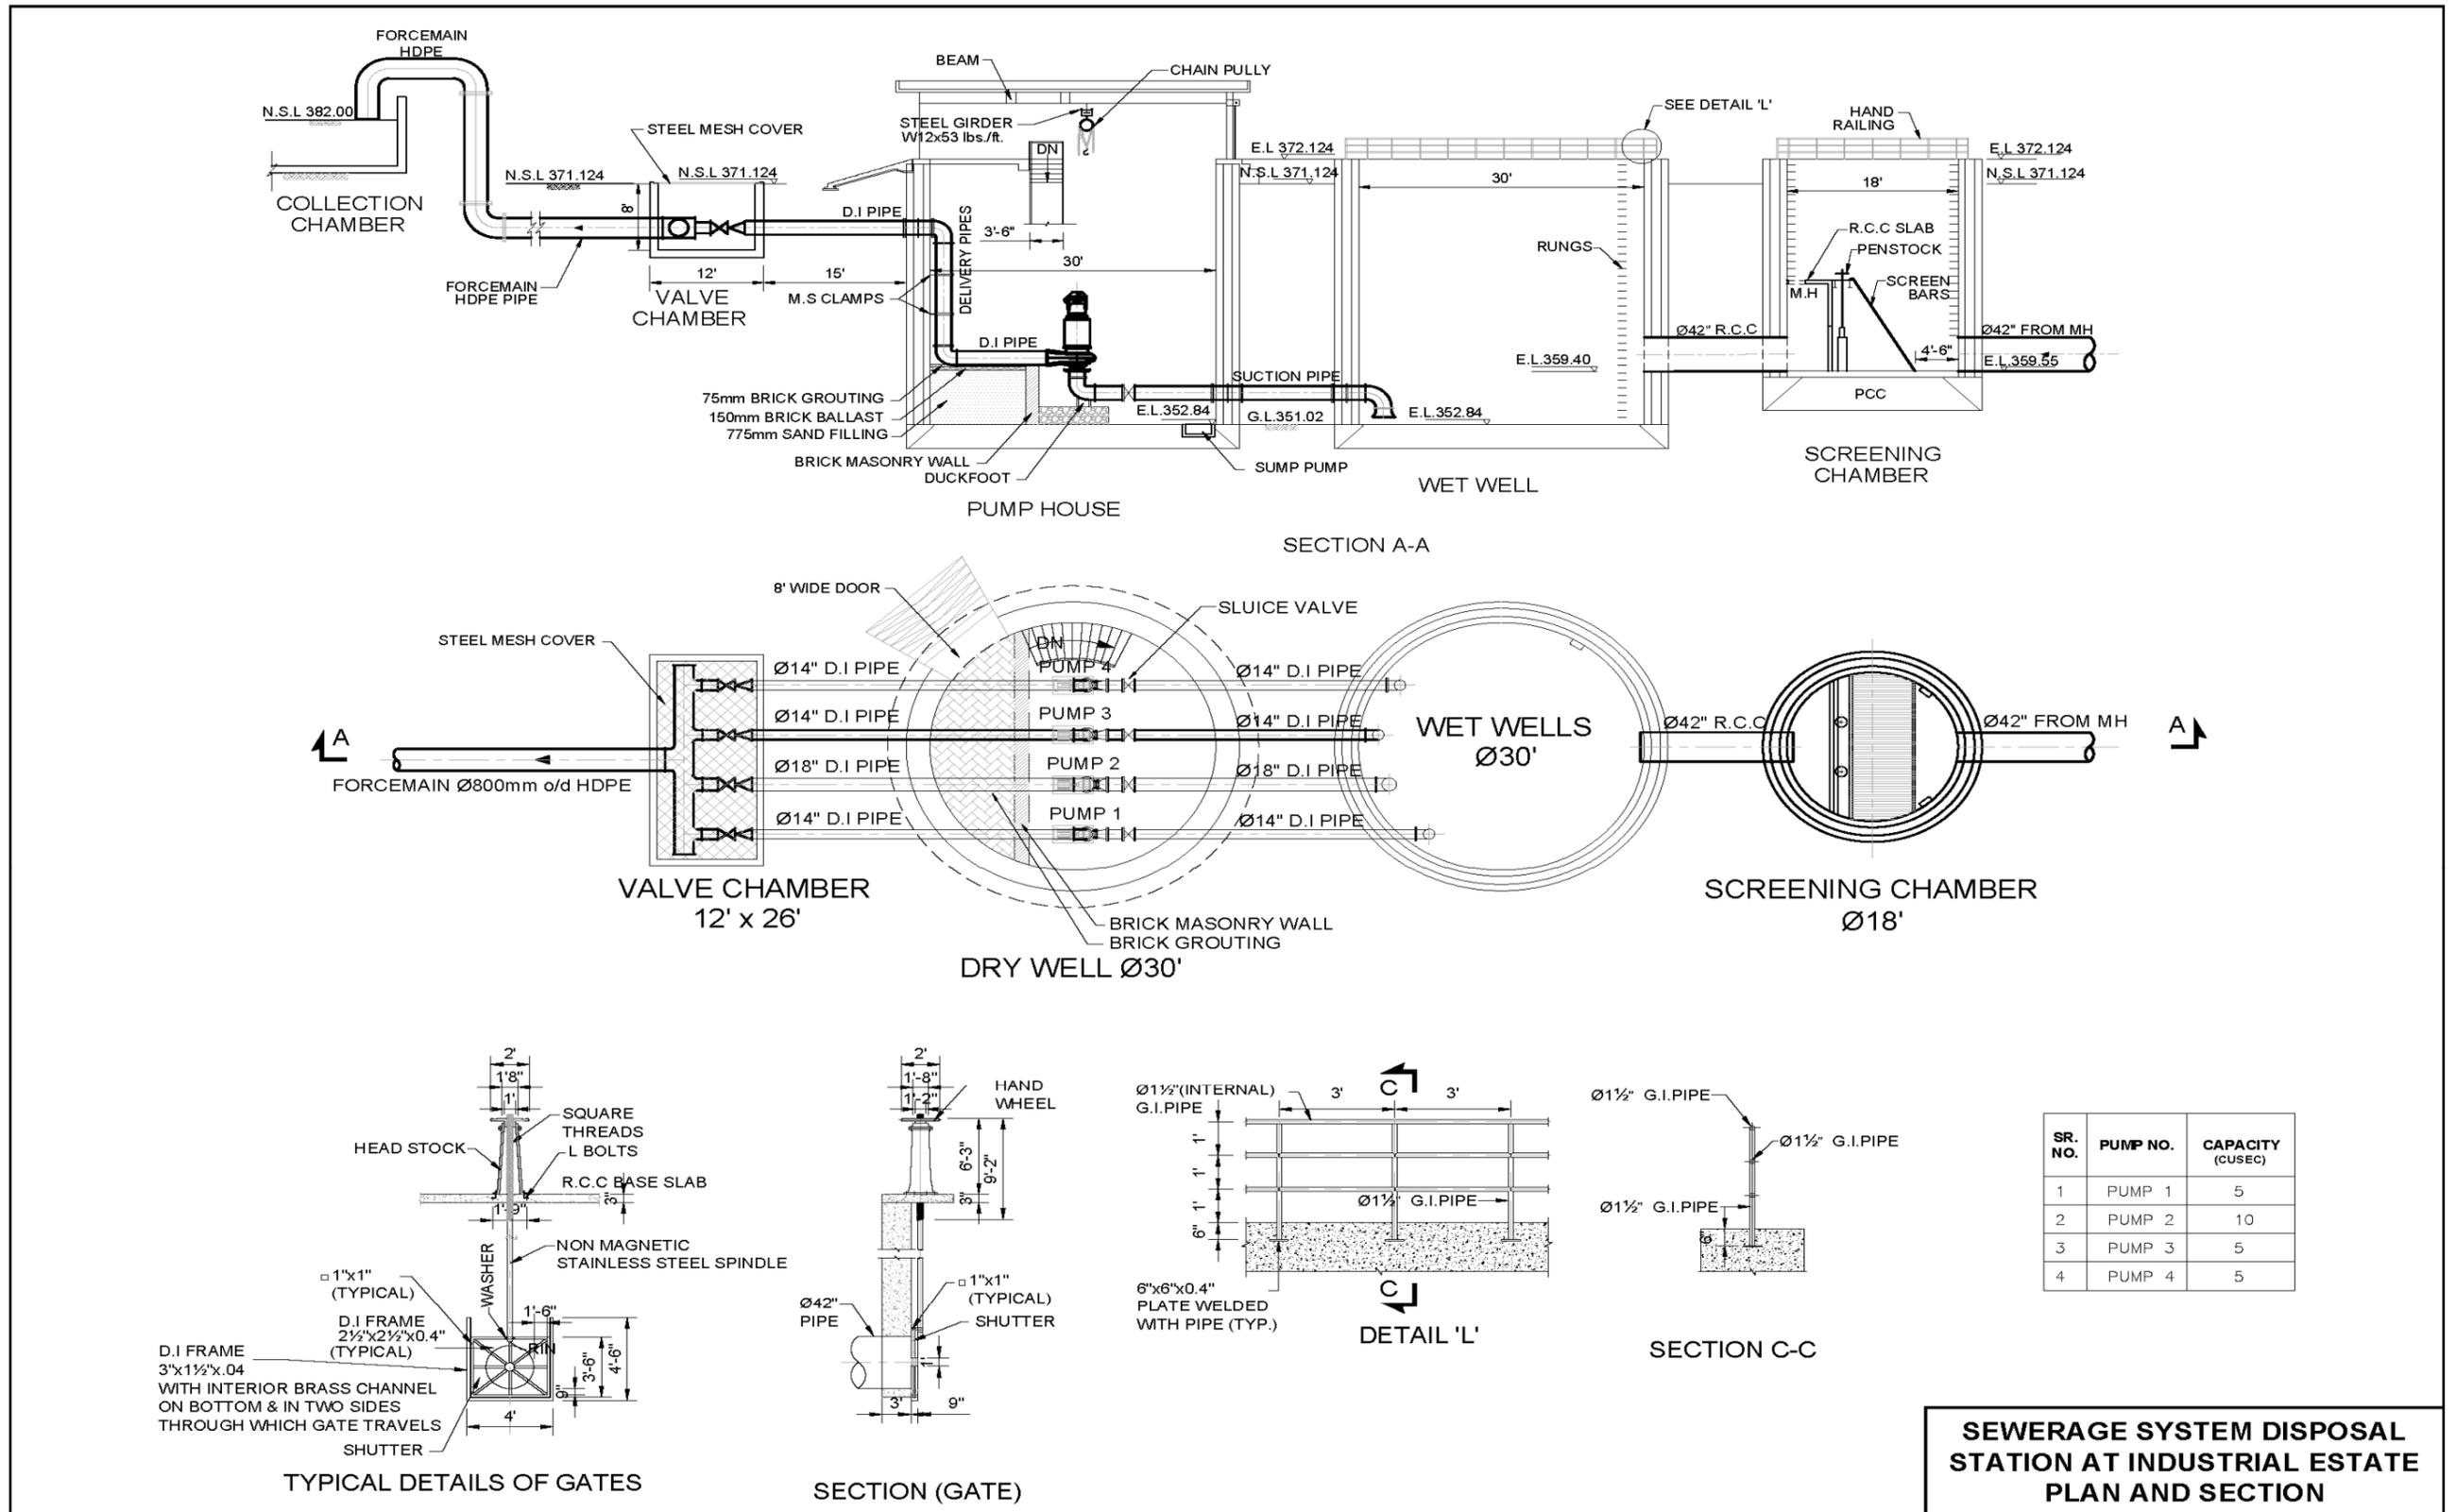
Layout Plan and Cross of Disposal Station (DS-I)
